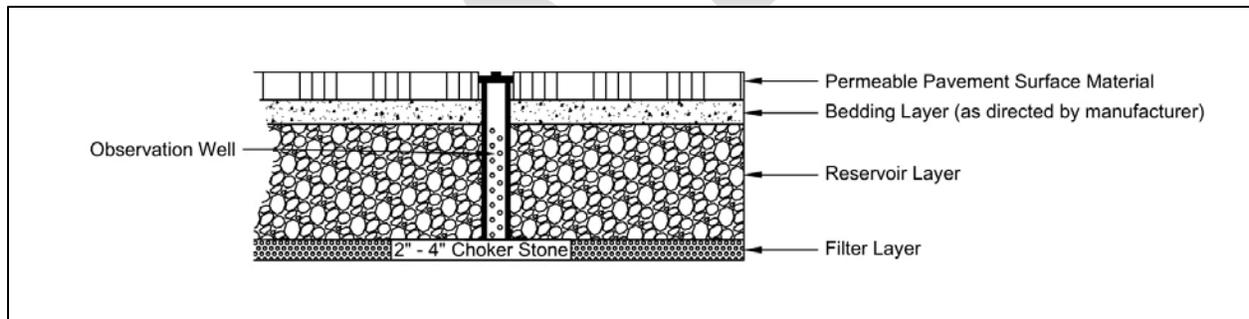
Cross-section of an enhanced permeable pavement design without an underdrain.
